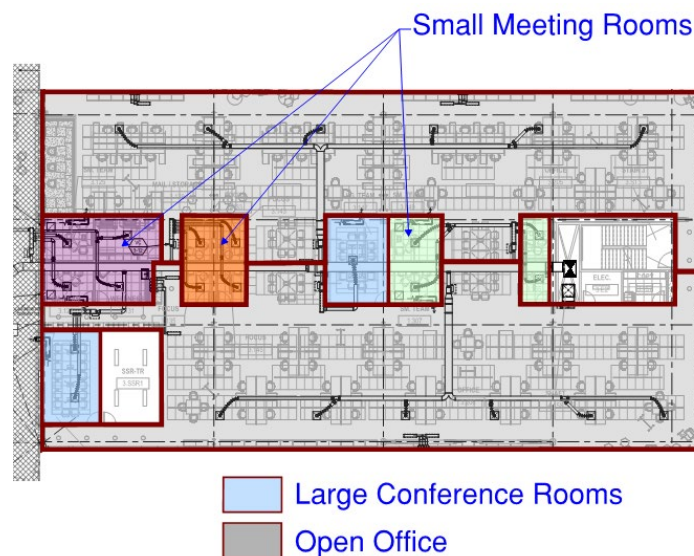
shows the ventilation zoning plan for each typical floor. The open office areas are divided by quadrant and are distinct from the thermal zones. Enclosed interior spaces are served with VAV ventilation zones, with clusters of four to six small meeting rooms served by a common VAV terminal and each of the four large conference rooms served by dedicated VAV terminals with demand-controlled ventilation. The ground floor DOAS zoning is designed with two additional perimeter zones (for the east and west perimeters) to handle envelope loads for those exposures.
